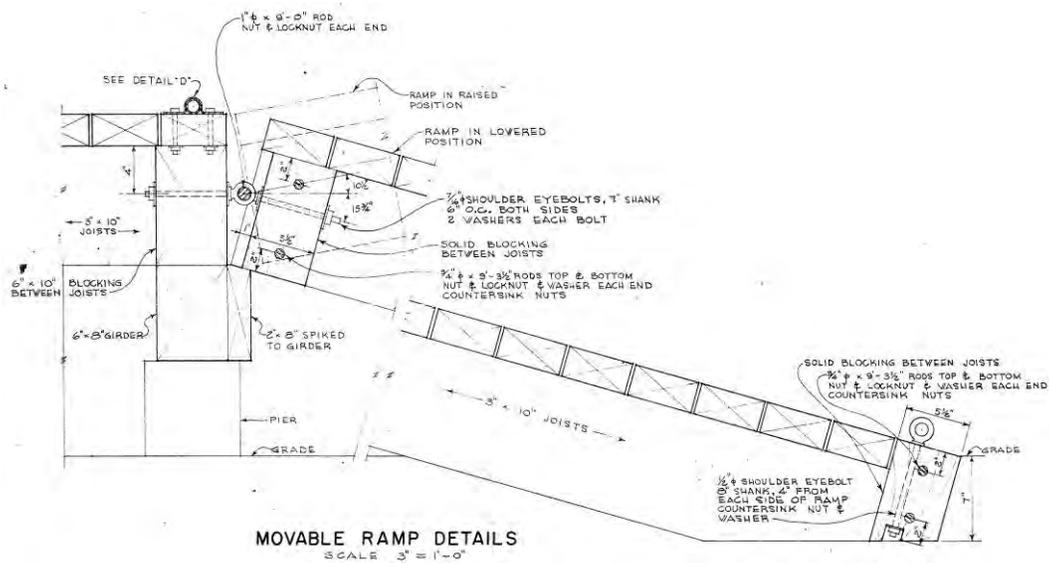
C-123 mock-up for airborne training, frame construction, movable ramp details, Fort Bragg, NC, 1951 (standard drawing 28-13-58 sheet 2 of 2; C-123 mock-up for airborne training, frame construction, details; 7 December 1951).
